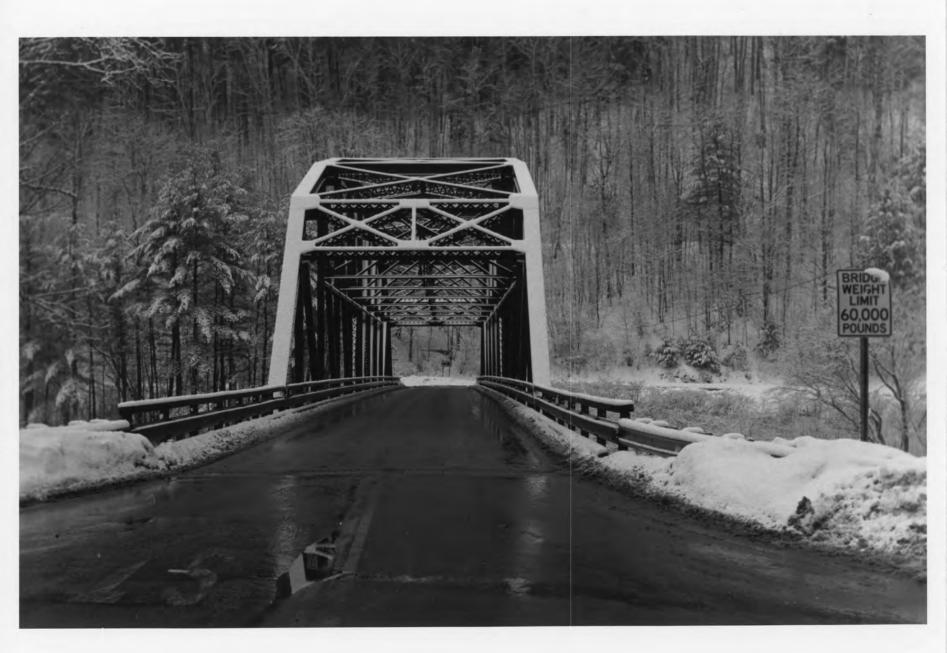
View looking north Photograph No. 3: View looking southeast
